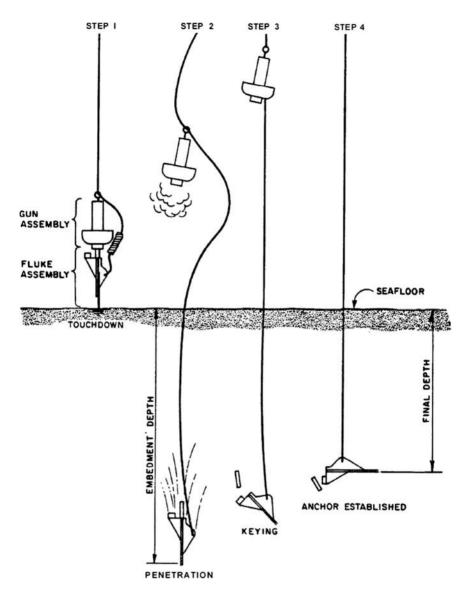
Propellant-embedded anchor Source: U.S. Navy (1985).
